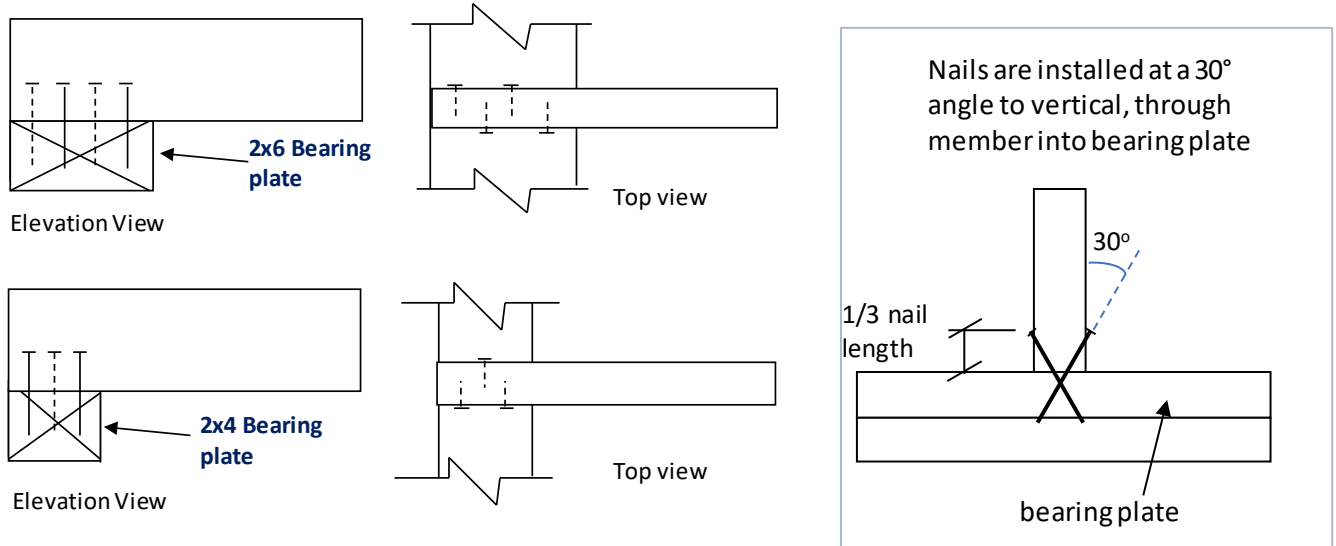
Toe-Nailing Rafter / Ceiling Member to Girder Truss
